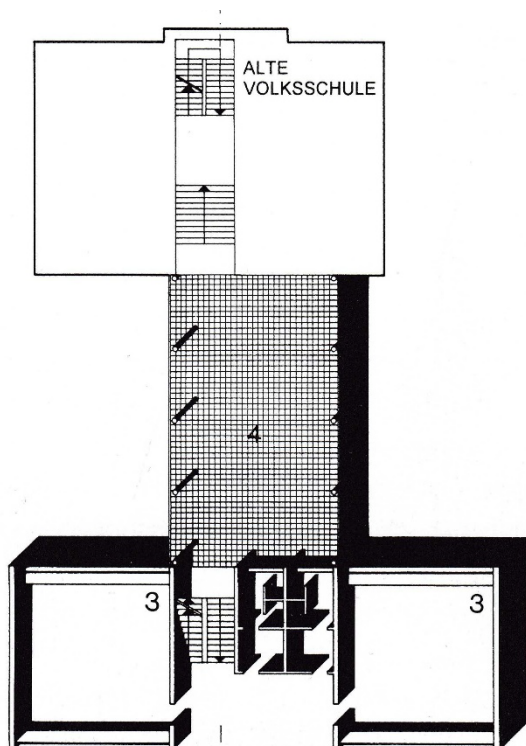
Floor plan annex to primary school in Gschwandt. Source: Hufnagl archive.
